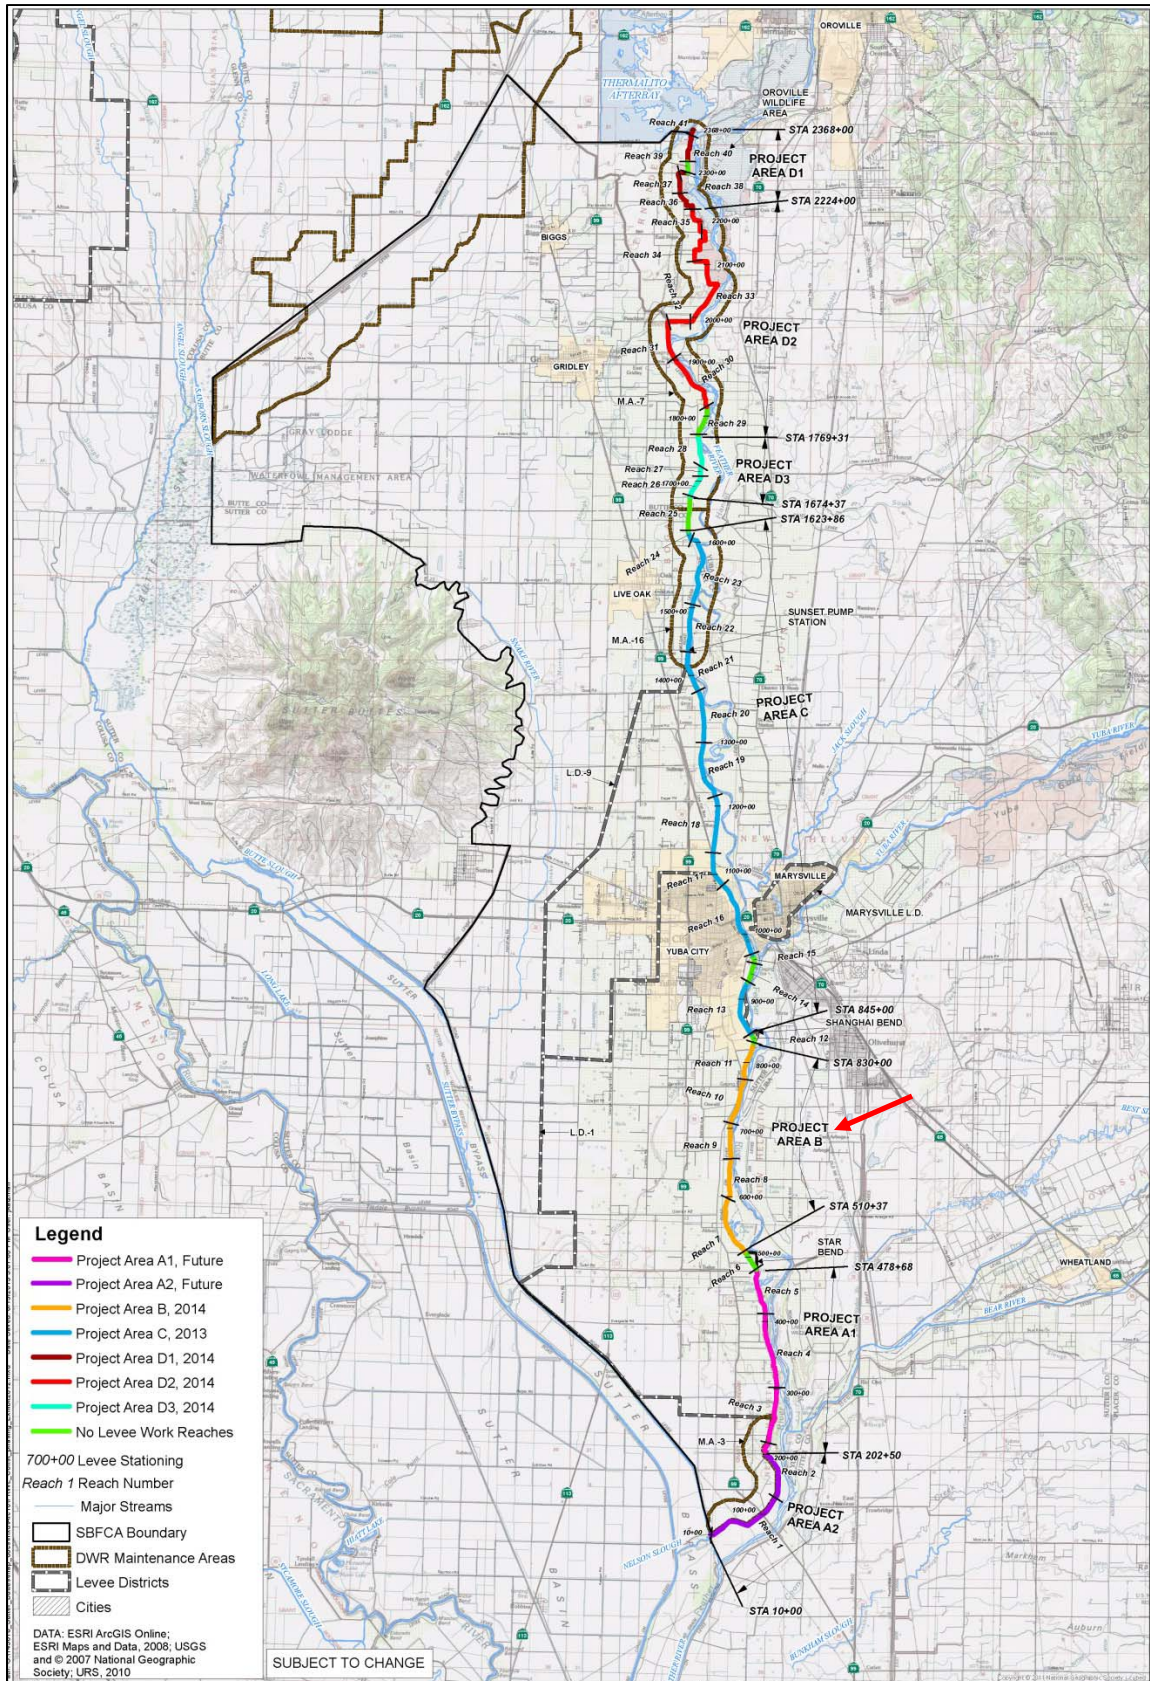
SBFCA FRWL Construction Phasing Plan (Source: HDR, August 2013)
